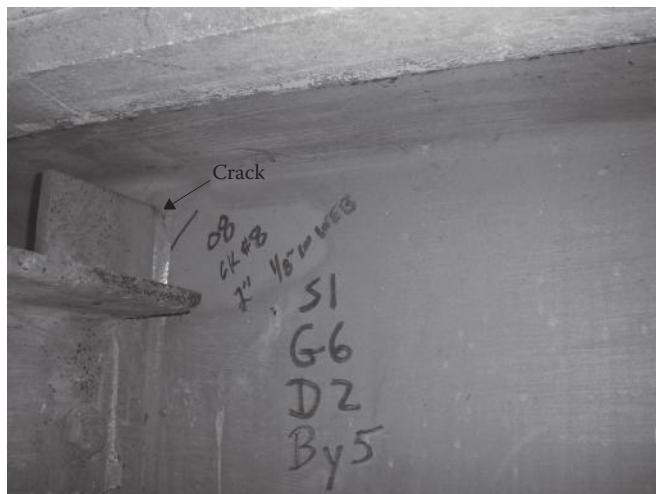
A distortion-induced fatigue crack on a steel girder bridge.
